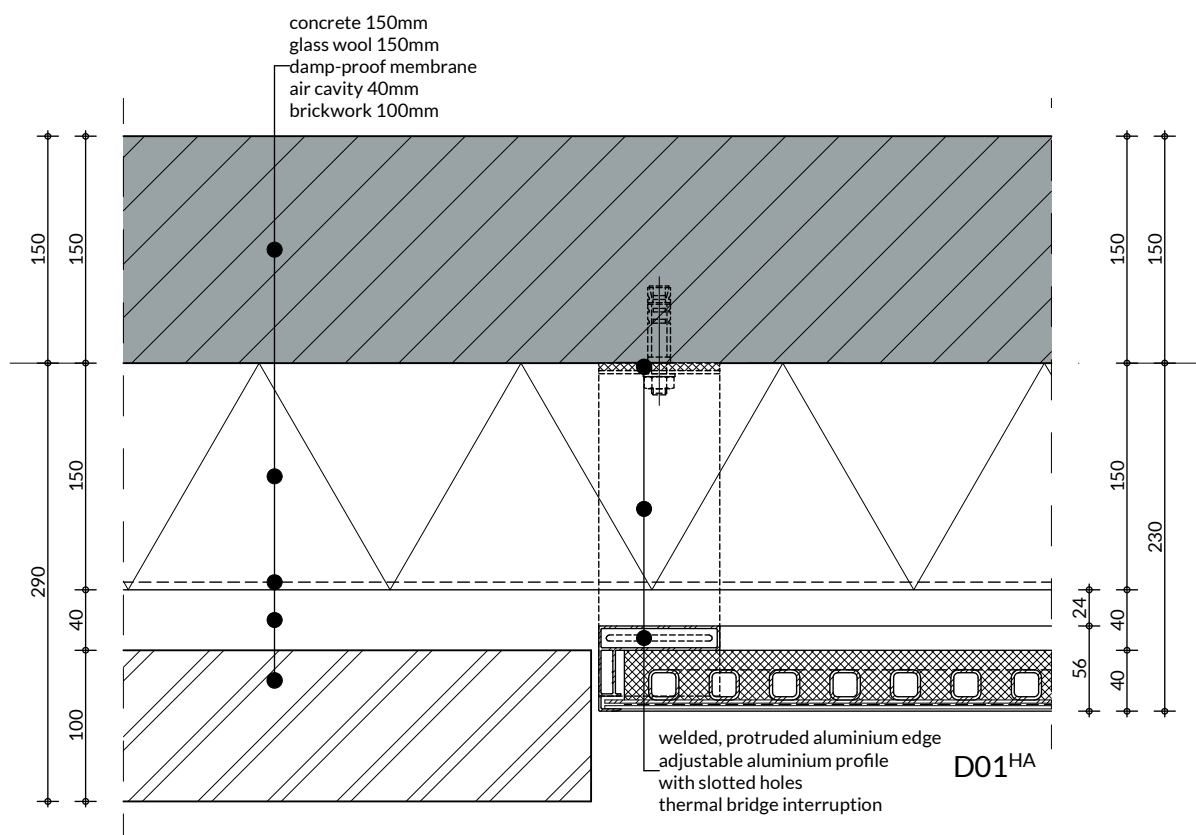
Cavity wall detail D01^{HA}, where the brickwork meets the PVT module (scale 1:5; own illustration).
